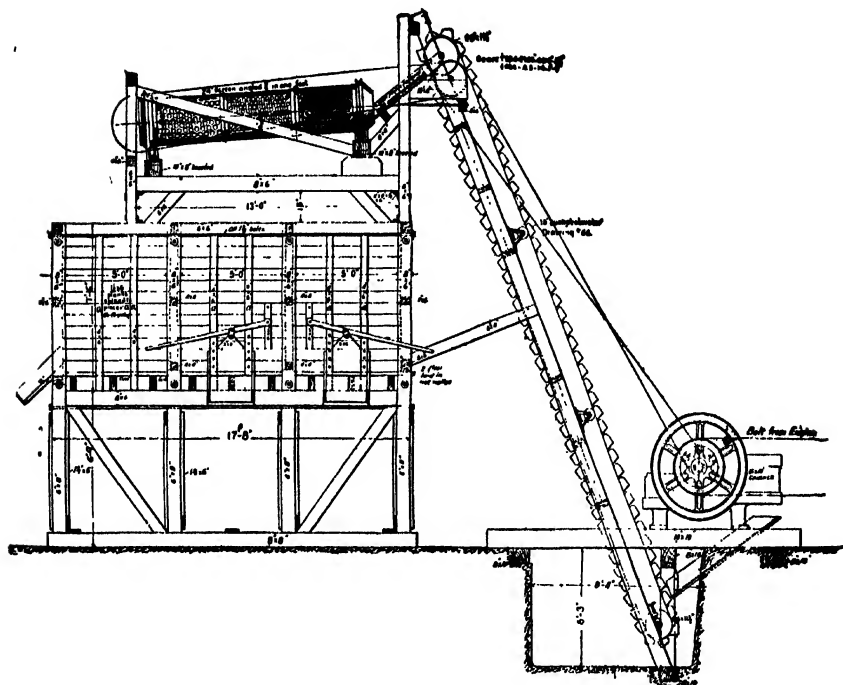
Small Crushing Plant with Elevator, Screen, and Portable Bins. (See p. 245.)
